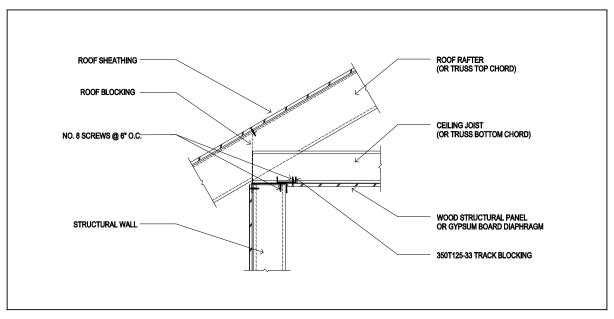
Ceiling Diaphragm to Sidewall Detail
